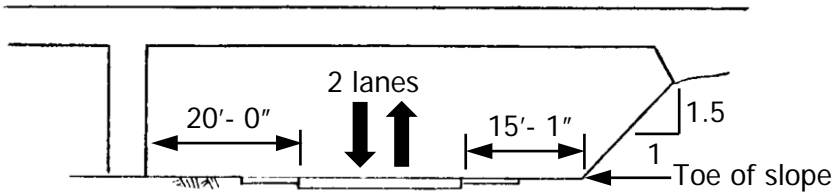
Bridge elevation view of horizontal clearances for a 2-lane highway feature with 2-way traffic below the bridge.
